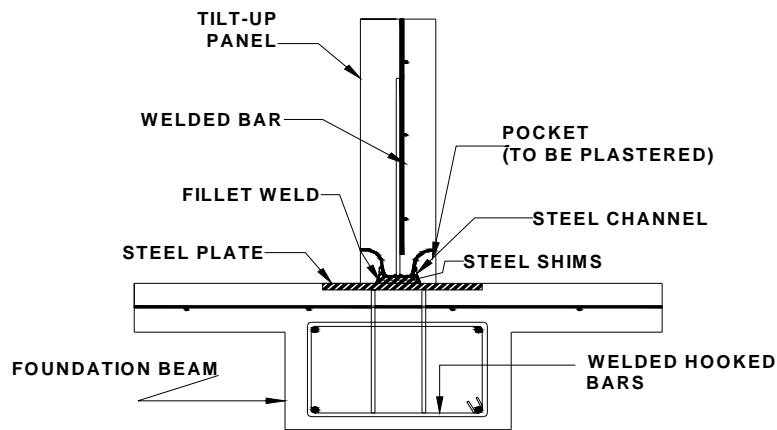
The connection between wall and foundation beam (Restrepo et al., 1996).
